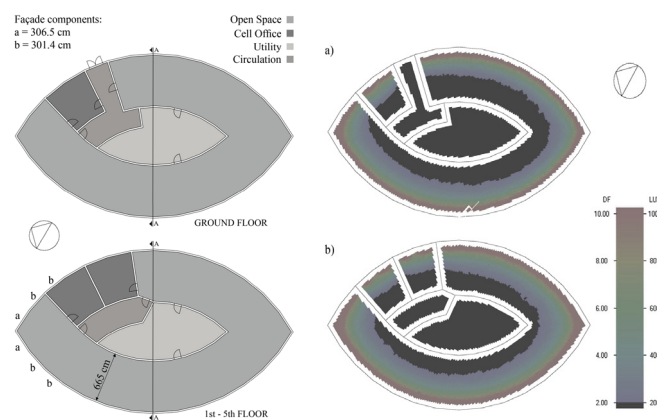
Floor plans of the "lemon" building [Author of the Article].
